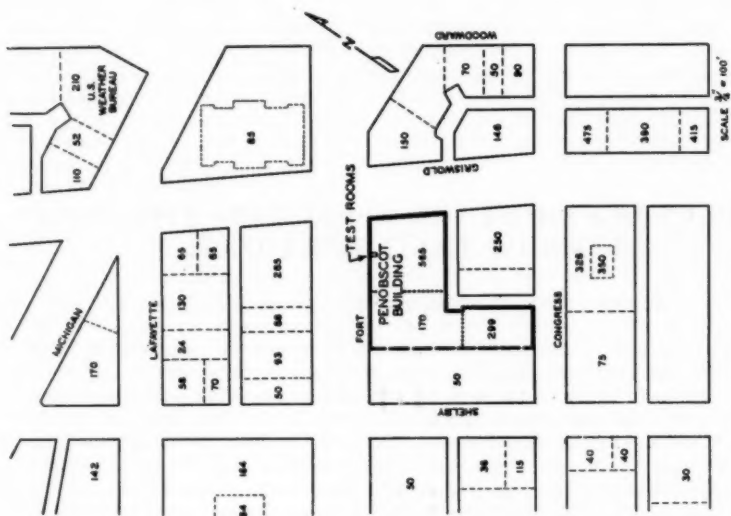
shows a ground plan of the Penobscot Building and the other buildings in the immediate vicinity with their elevations indicated. Fig. 3 is a cross-section of the 8th floor which is the same for all floors up to the 31st floor. The cross-section decreases slightly from this point up to the top floor by set-backs at approximately every four floors.
